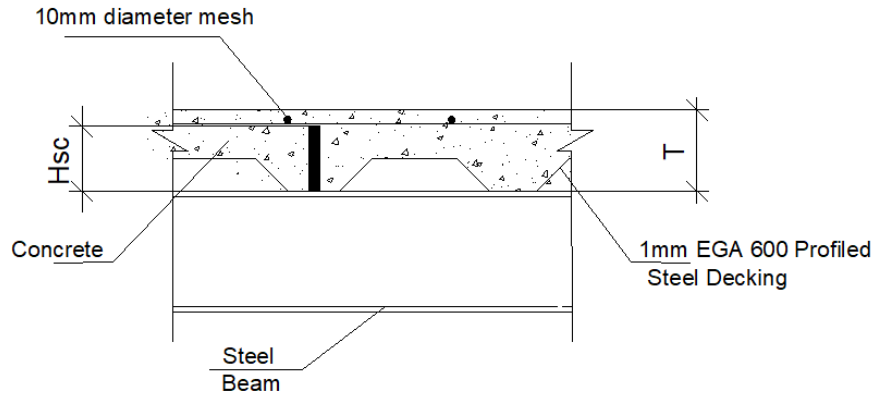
Composite Beam section detail with profiled steel sheeting transverse to the beam according to BS
